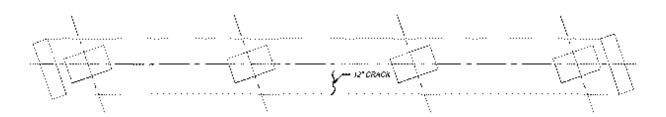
Location of Proposed Concrete Repairs - Rear (South) Abutment Plan MP 182.1
